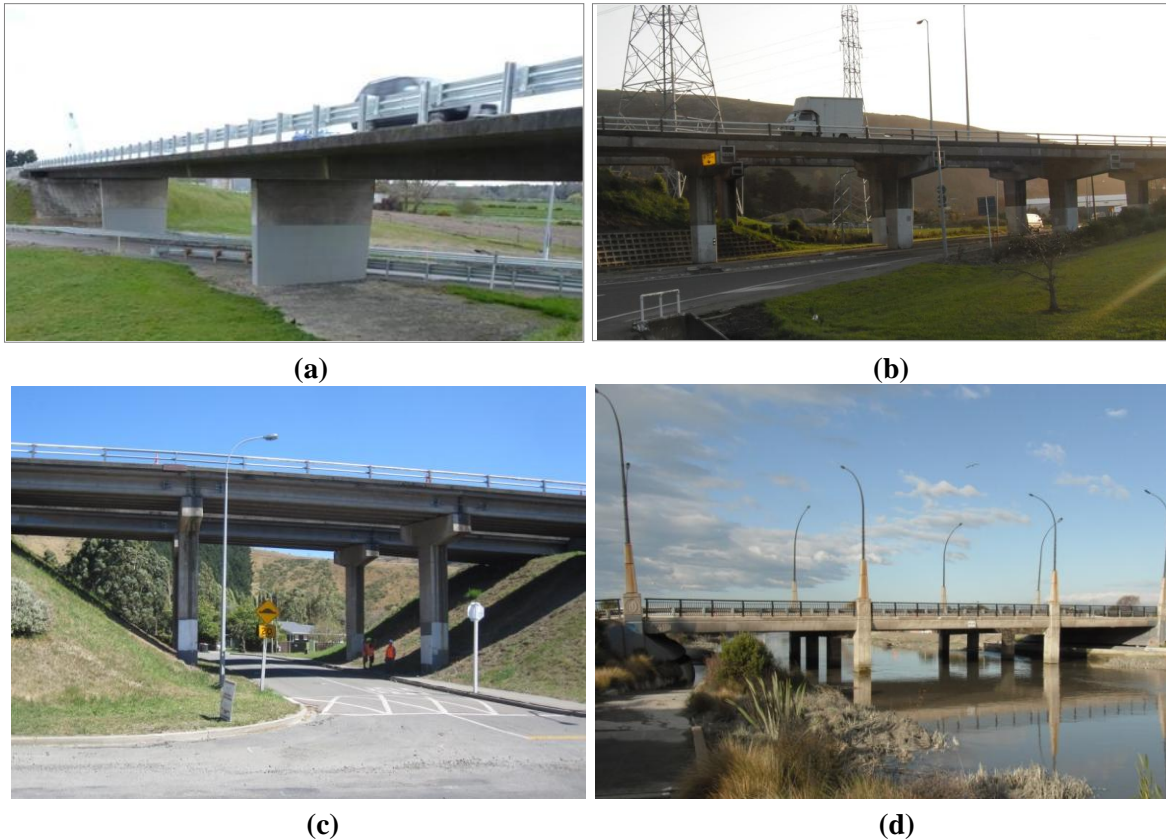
Overall view of some damaged highway bridges after February 22, 2011. a) Channeys Pass Road Bridge [Photo by M. Anagnostopoulou]; b) Port Hills Overbridge [Courtesy of OPUS]; c) Horotane Overbridge [Courtesy of OPUS]; d) Anzac Drive Bridge [Photo by E. Camnasio]
